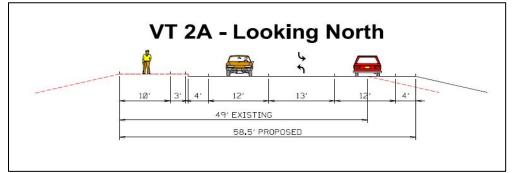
Proposed VT 2A Cross Section Treatment North of Industrial Avenue
